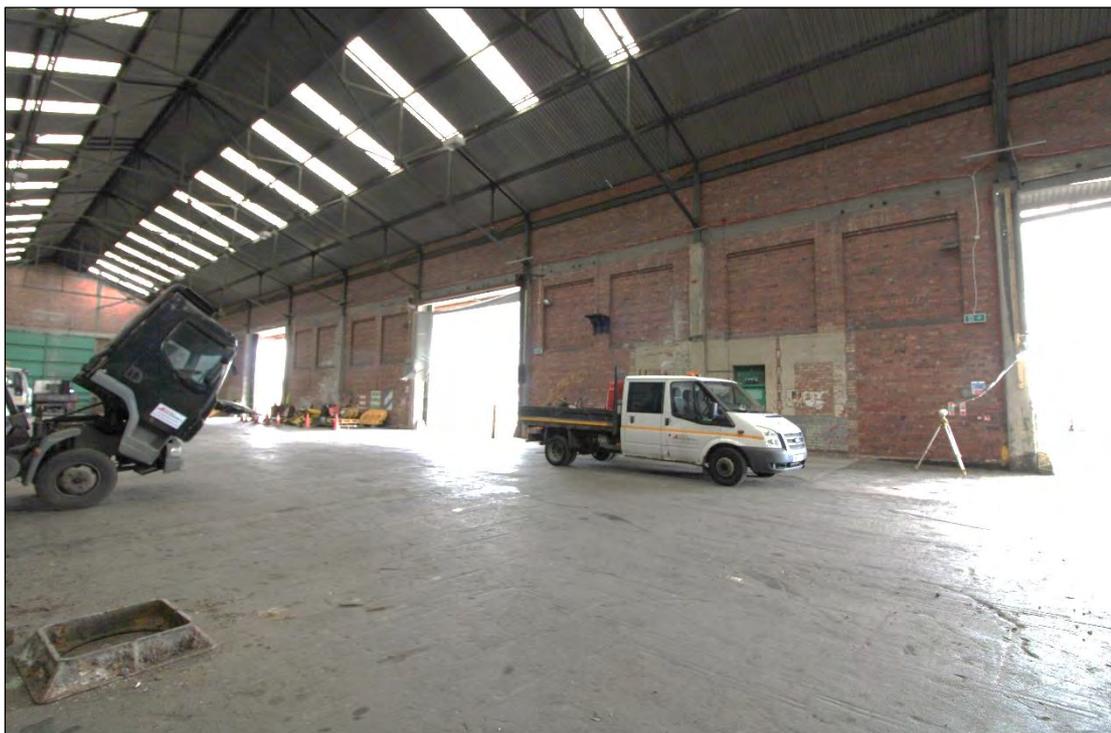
Former single-storey structure in bays 17 and 18, facing south
